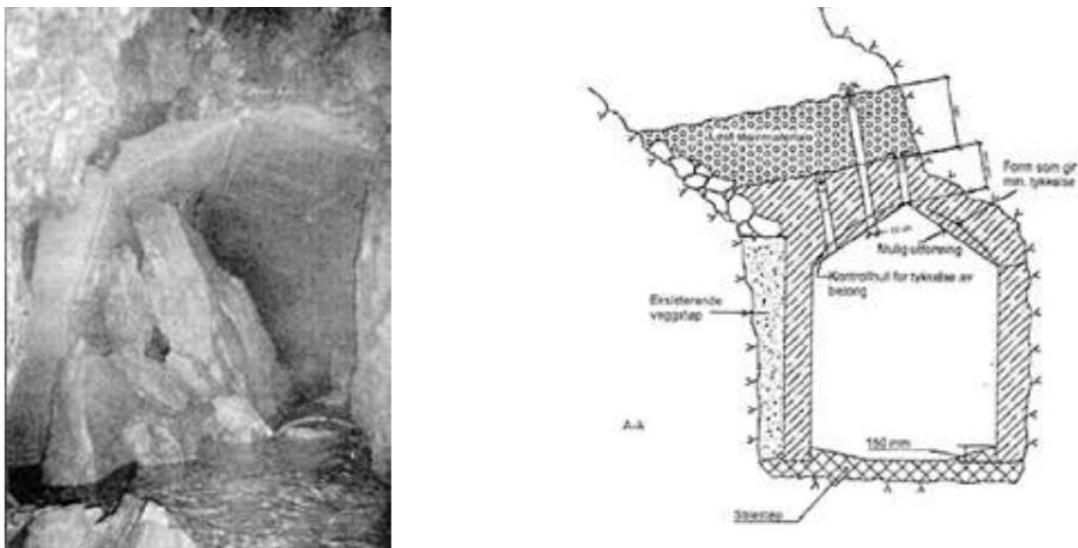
The cave-in at Mauranger HPP with old failed concrete support. Here it was constructed a new support with dampening masses on the roof of the support construction (Palmstrøm, 2018).
